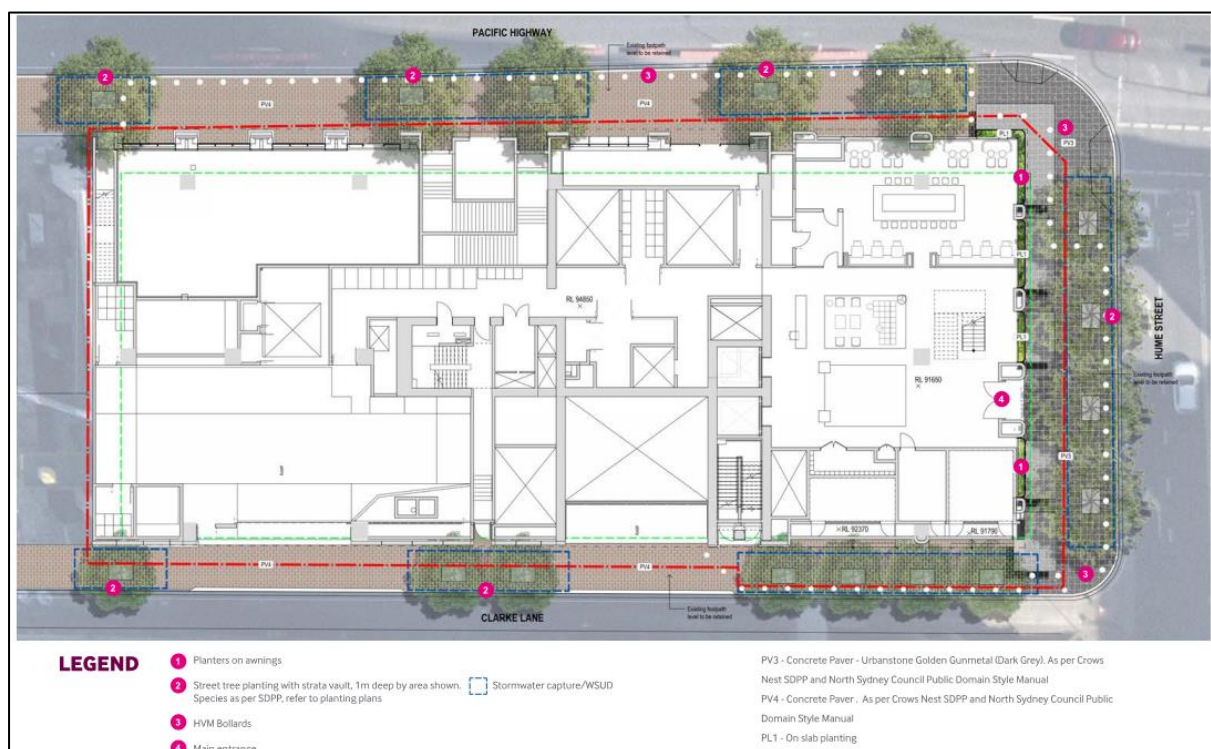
Ground Floor and Public Domain Landscape Plan (Source: RPS)
